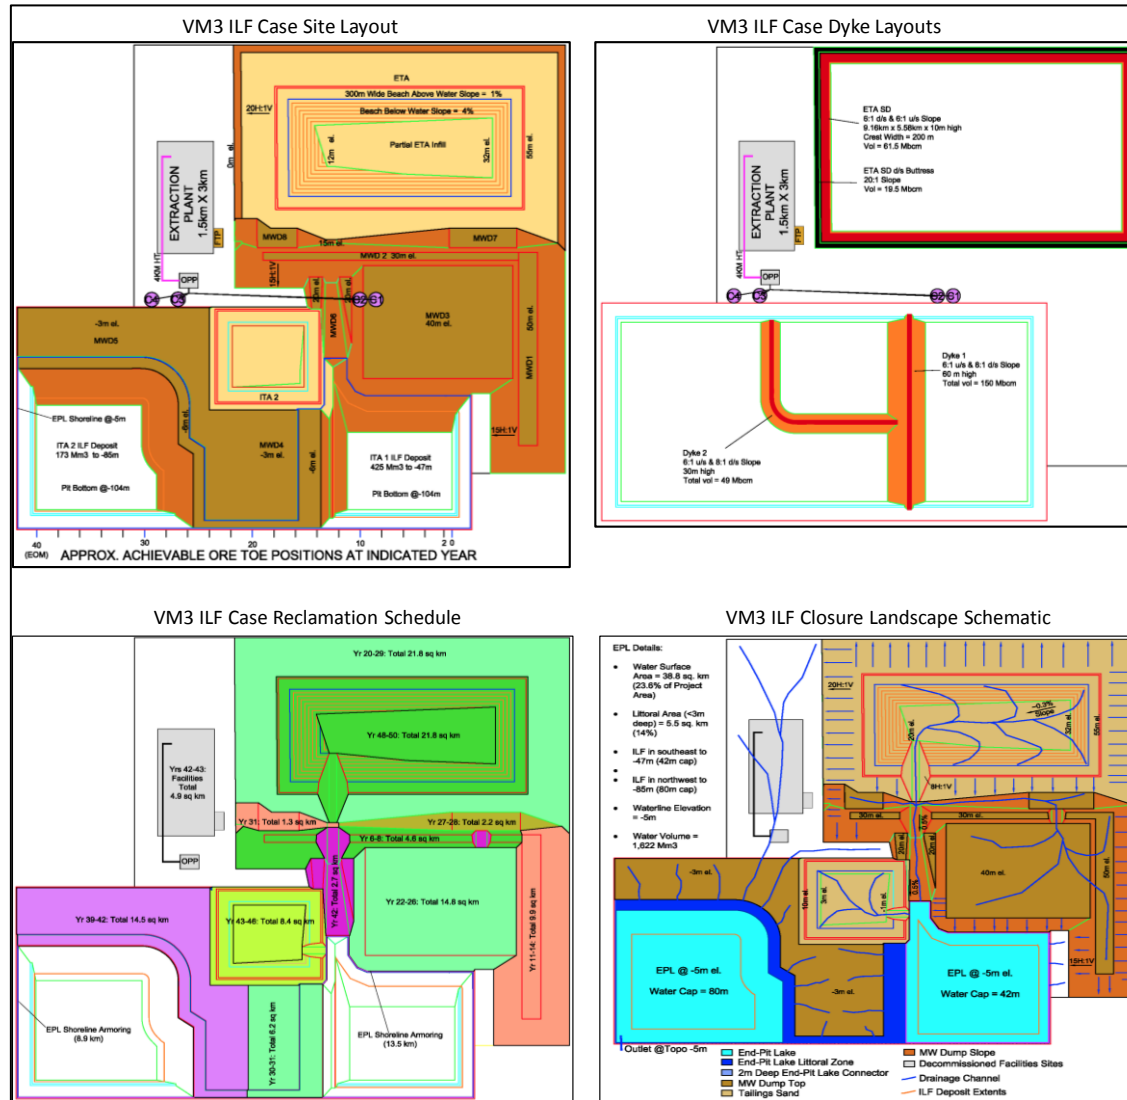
Site Layout and Progression to Closure for VM3 ILF Case
